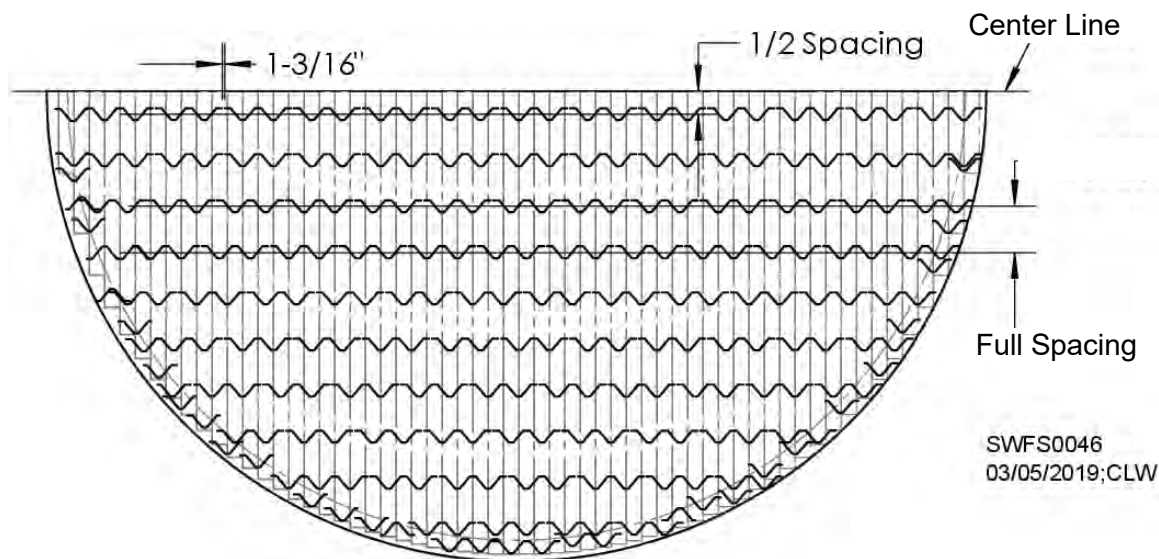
Typical SuperWave spacing in 36' dia. bin w/ HD Perf. flooring
